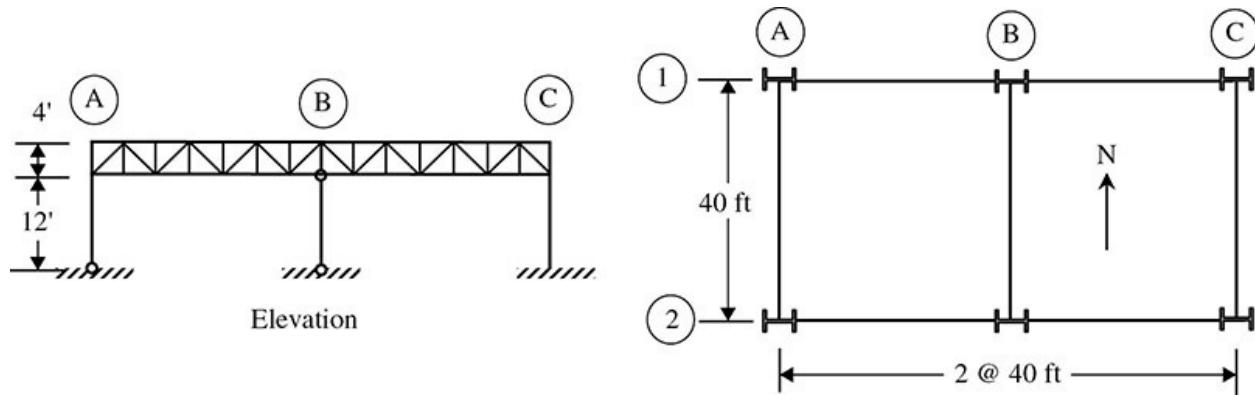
Elevation and plan view of space grid roof structure.
